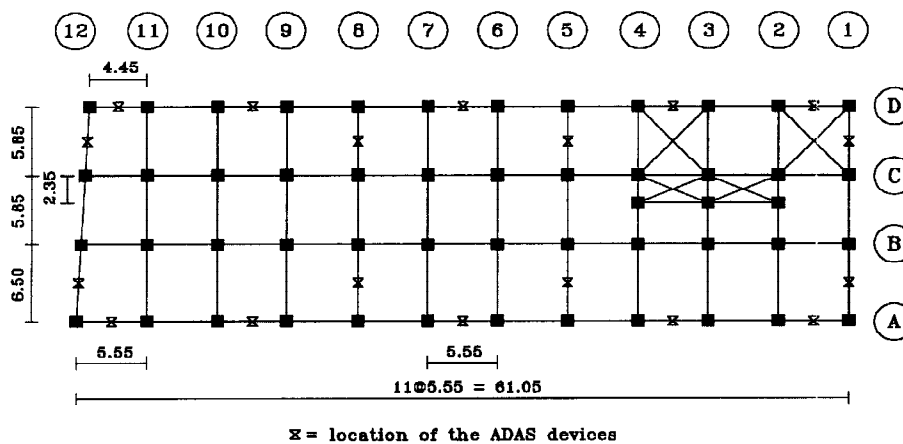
Plan view for the original and ADAS retrofit building (dimensions in meters)
